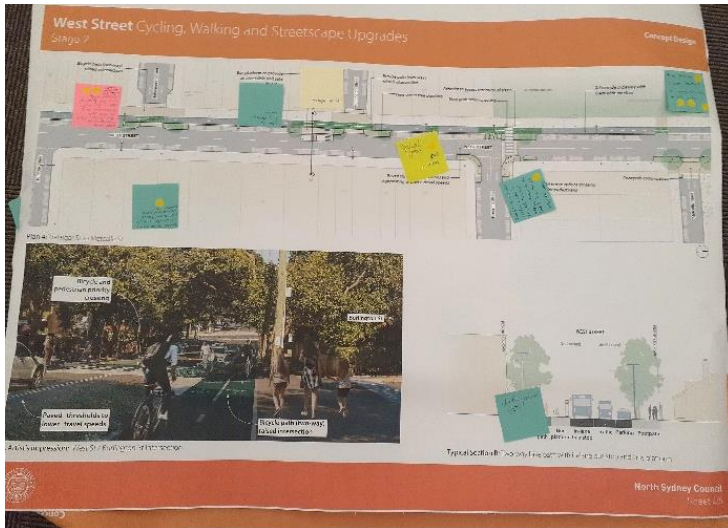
West Street, between Trafalgar Street and Metcalfe Street
